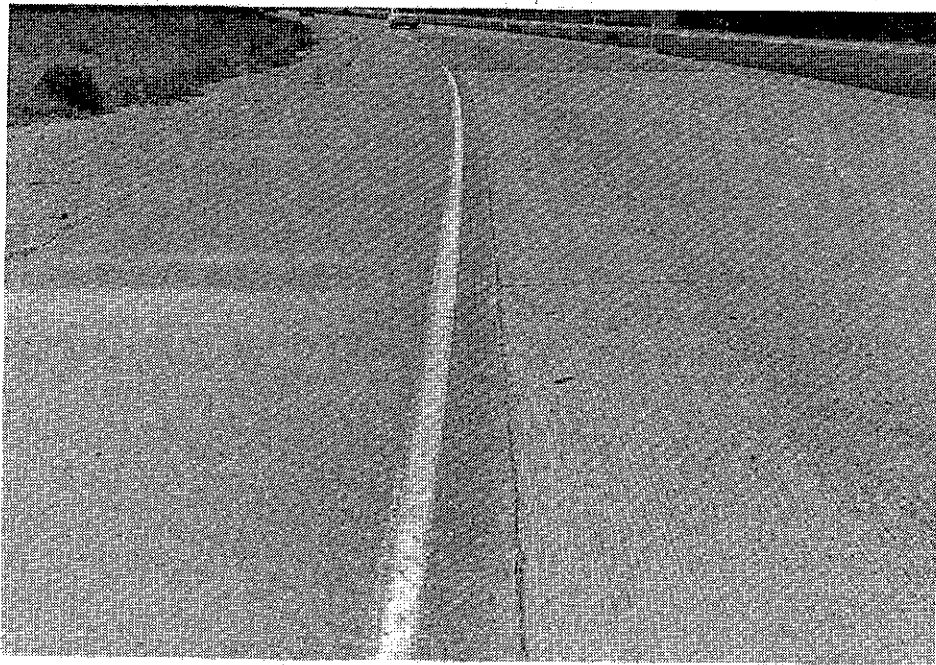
Standard shoulder with heavier pumping stains and shoulder depressions at joints.
